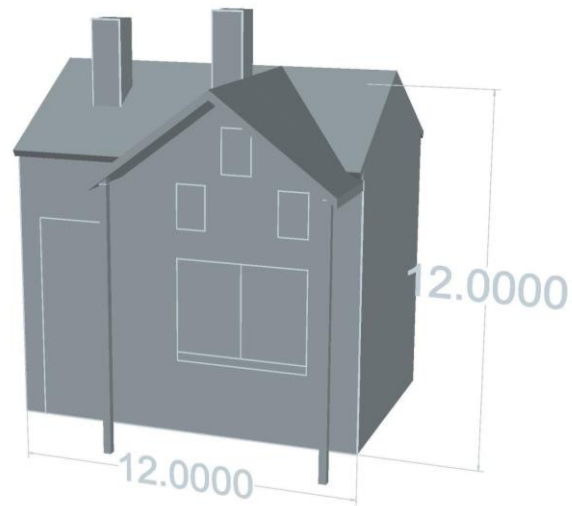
3D CAD Façade Drawing of Bowen's Tavern
